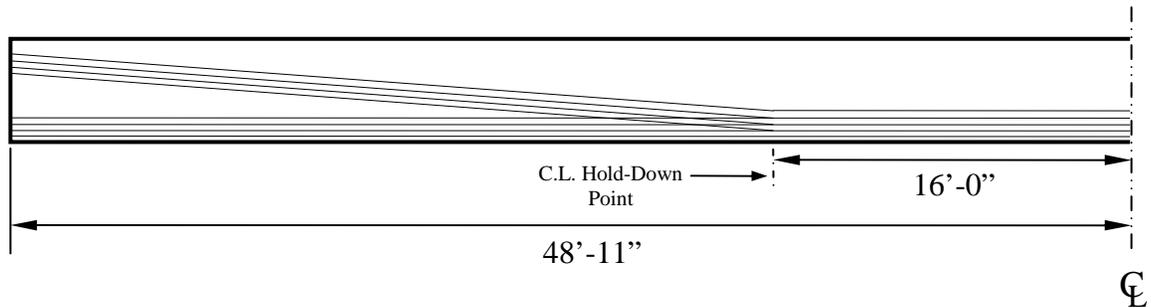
Profile and Hold-Down of Draped Strands for BT-54 Girder
